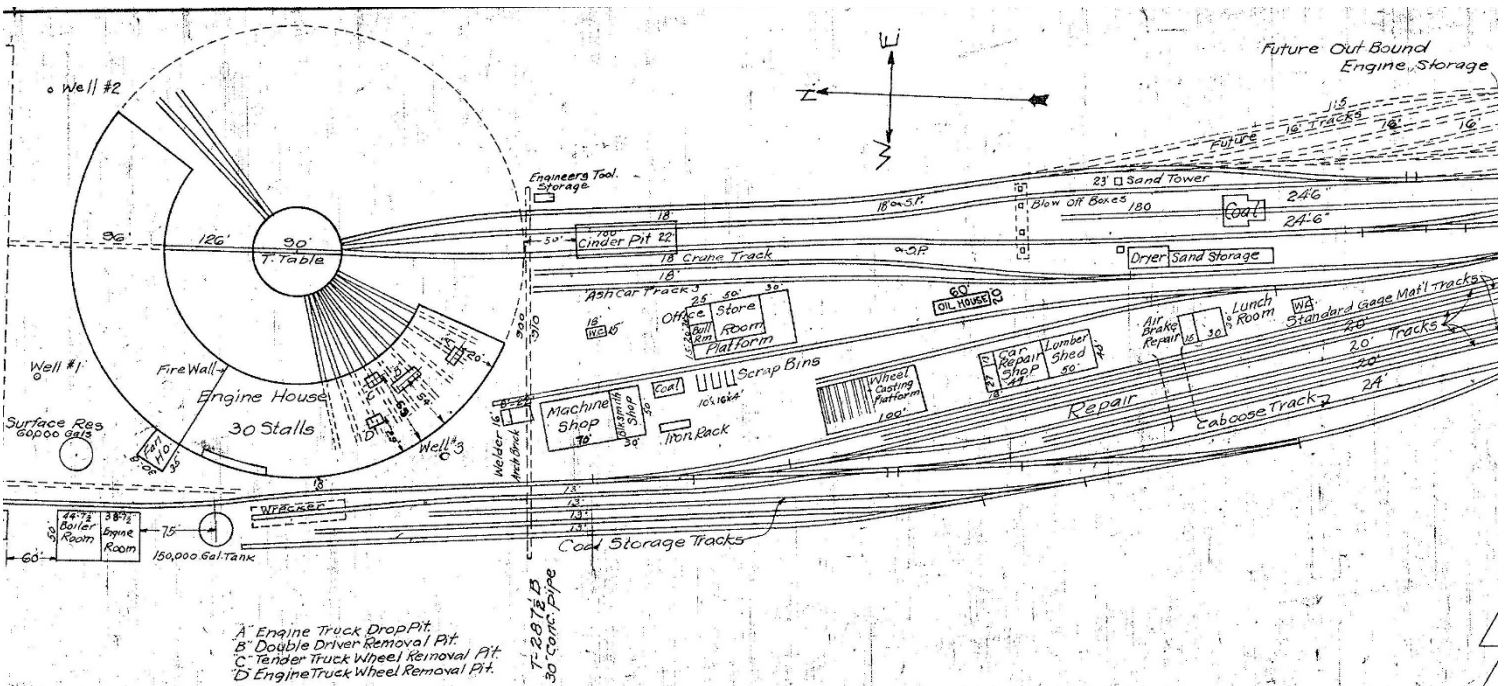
1917 General layout and track plans of the Sioux City Repair Shops complex. Drawn by: Engineering Department, Chicago, Milwaukee and St. Paul Railroad Company. Source: The Milwaukee Road Archives, Milwaukee Public Library.
